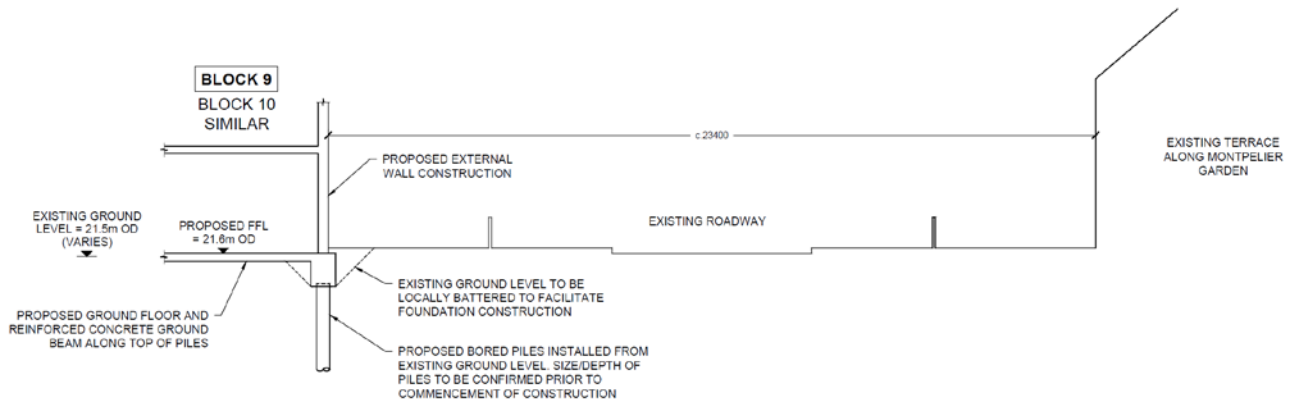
Indicative section of Block 9: Montpellier Gardens
